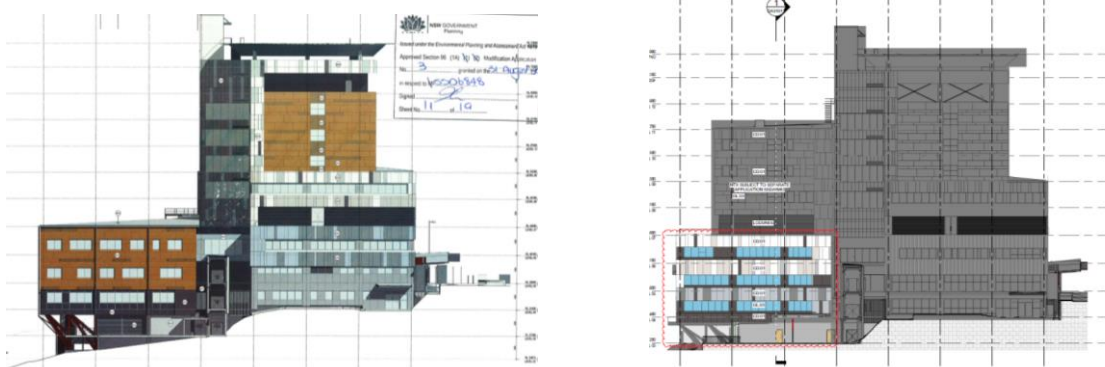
Approved vs Proposed Eastern Elevation of Stage 3 (Source: First image Woods Bagot & second image Conrad Gargett)
